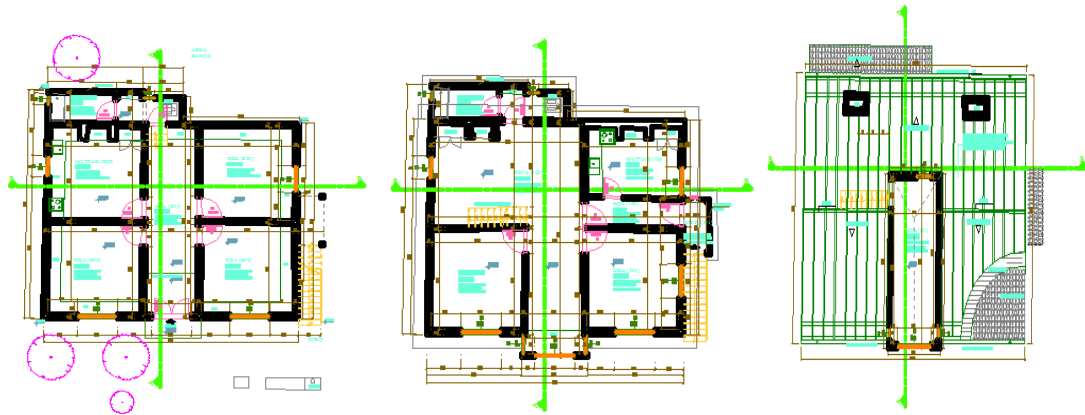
Halim Düzgün House's restoration ground floor plan, first floor plan and roof plan
